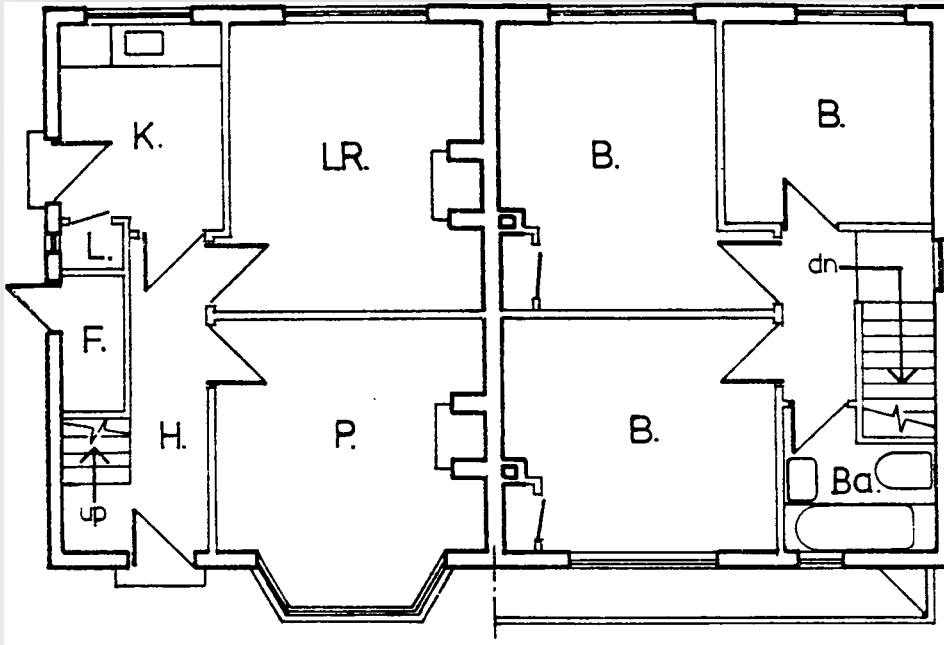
A SEMI-DETACHED HOUSE WITH GARAGE 1953.
